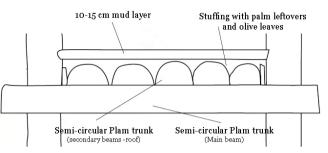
Cross section at the typical traditional palm trunks roof (Savolde 2009, 50)
